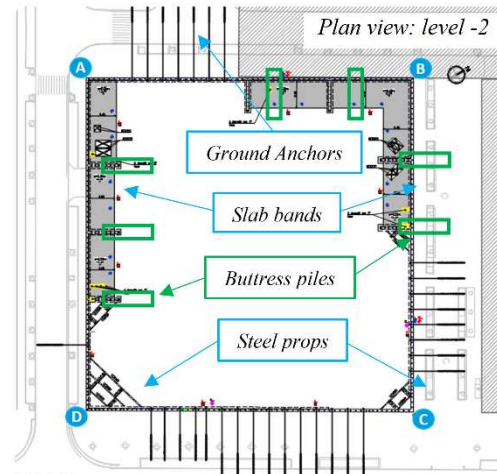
Design plan view of the peripheral earth retaining solution at level -2.
